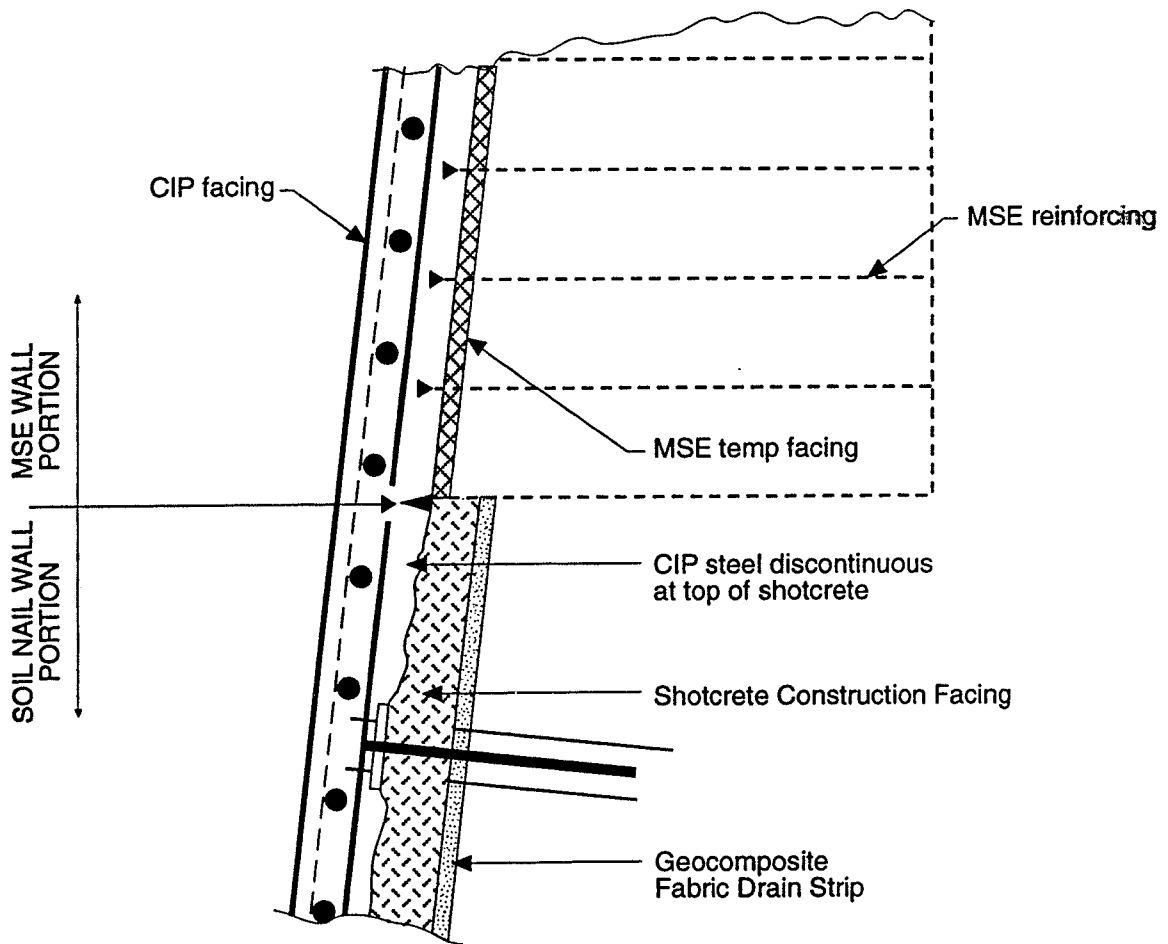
Example of Soil Nail Wall Supporting MSE Wall (Oregon DOT Portland, OR Light Rail Project)
